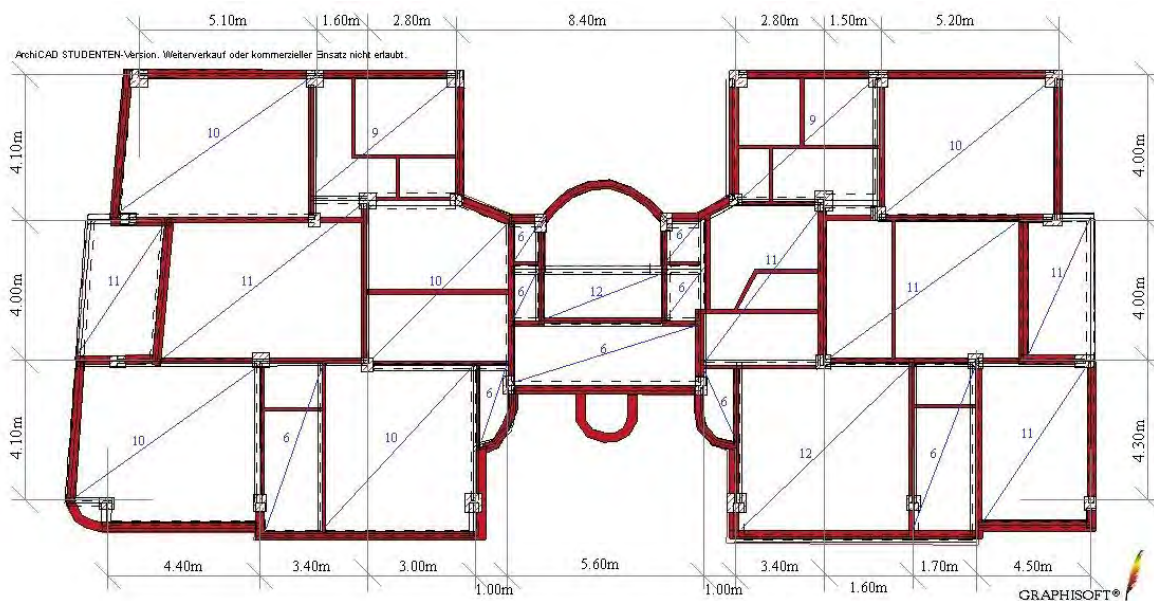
Floor plan including the load bearing elements as masonry walls and slab thickness (blue), as well as the spans. (after Bostenaru, 2004)
